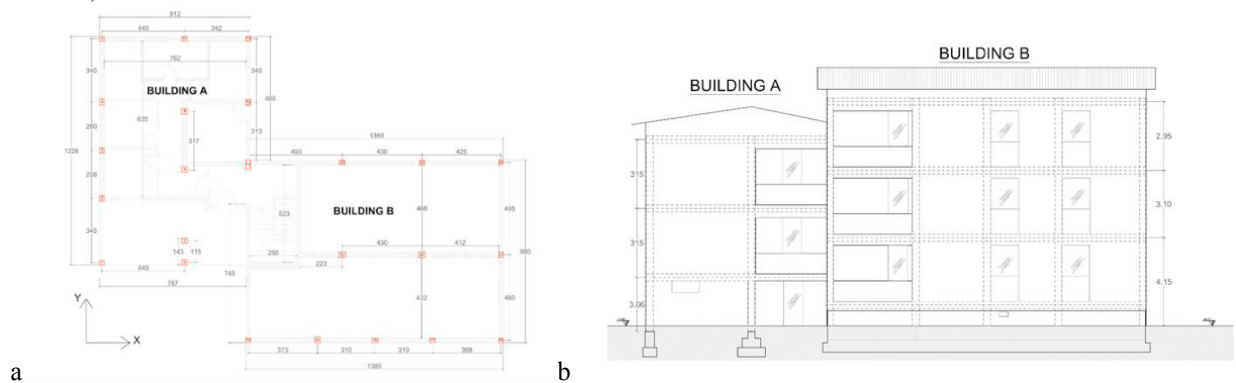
(a) Existing building plan; (b) Existing building elevation (© ALER Brescia-Cremona-Mantova).
